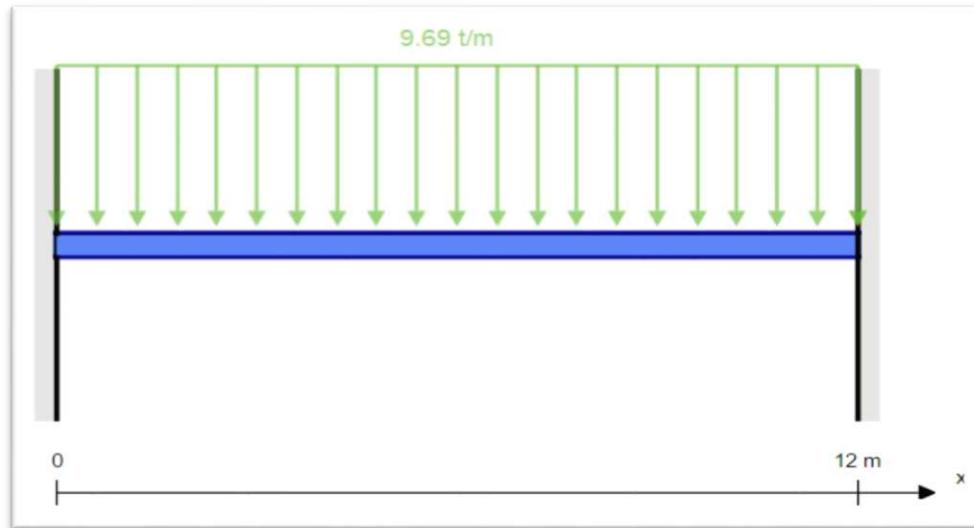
ETABS drawing, mezzanine floor, Girder 2
